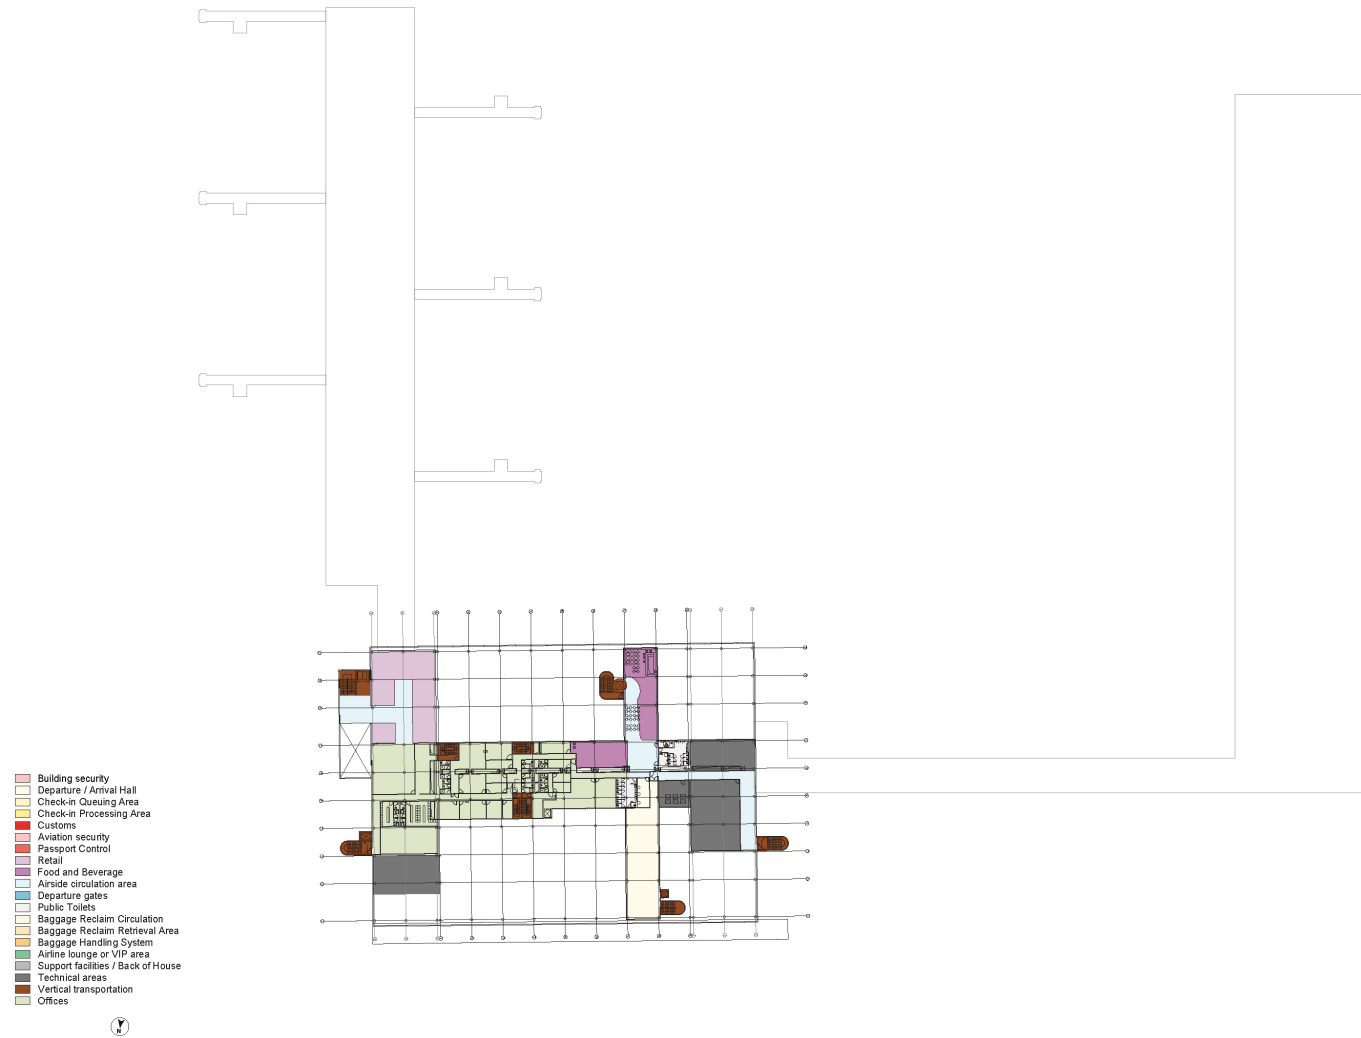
PROPOSED FUNCTIONAL LAYOUT LEVEL 3 (SECOND FLOOR)
